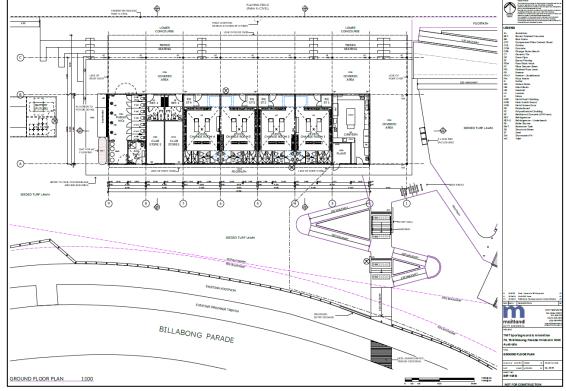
Proposed Building Floorplan Extracted from Attachment 1 (Source: Council, 31/07/2025)
